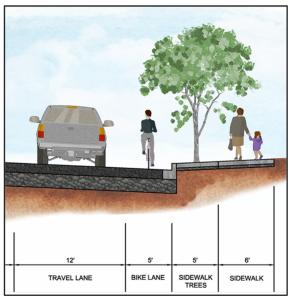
Bike Lane and Sidewalk Alternative (MM1).
